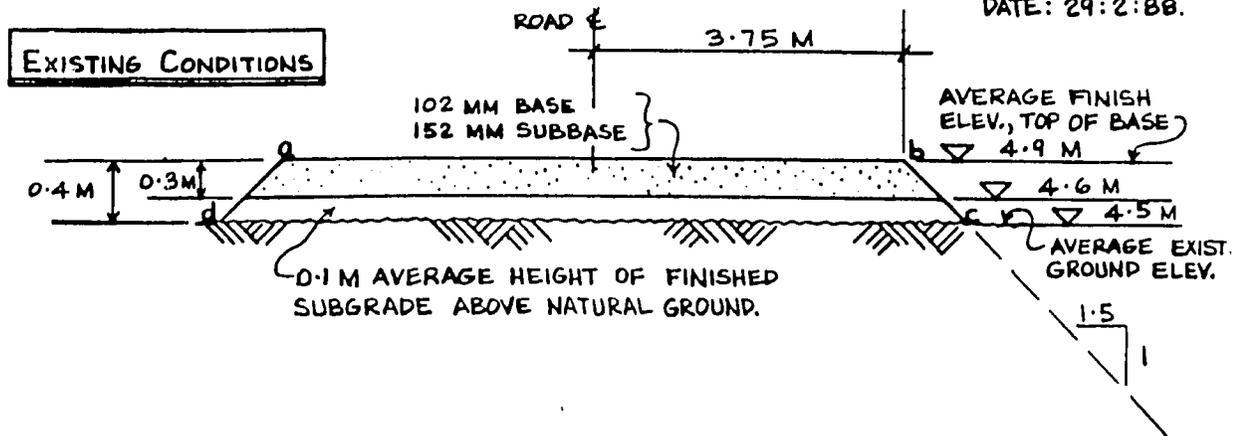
FIG. E - AVERAGE FINISHED ROADWAY EMBANKMENT SECTION - (STA. 6+100 TO STA. 10+376, PRESENT DESIGN)
